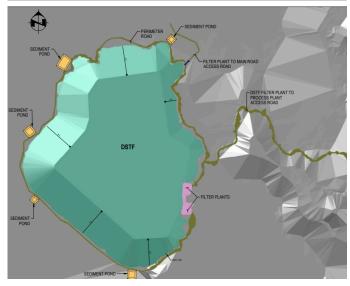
Plan view of the Dry Stack Tailings Storage Facility
